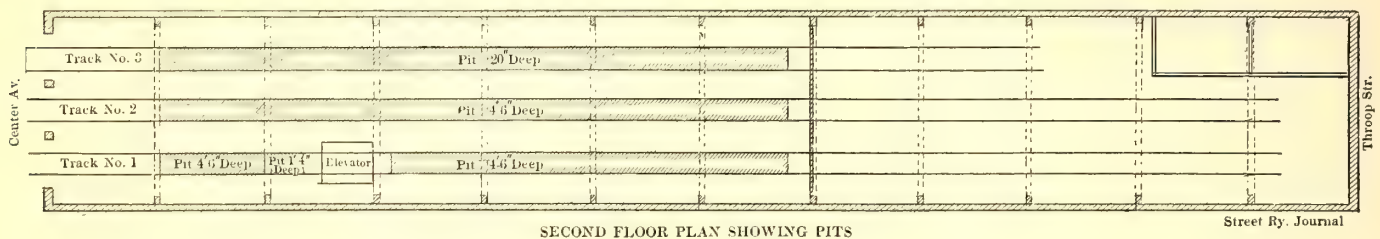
PLAN OF SECOND FLOOR OF THROOP STREET REPAIR SHOP
